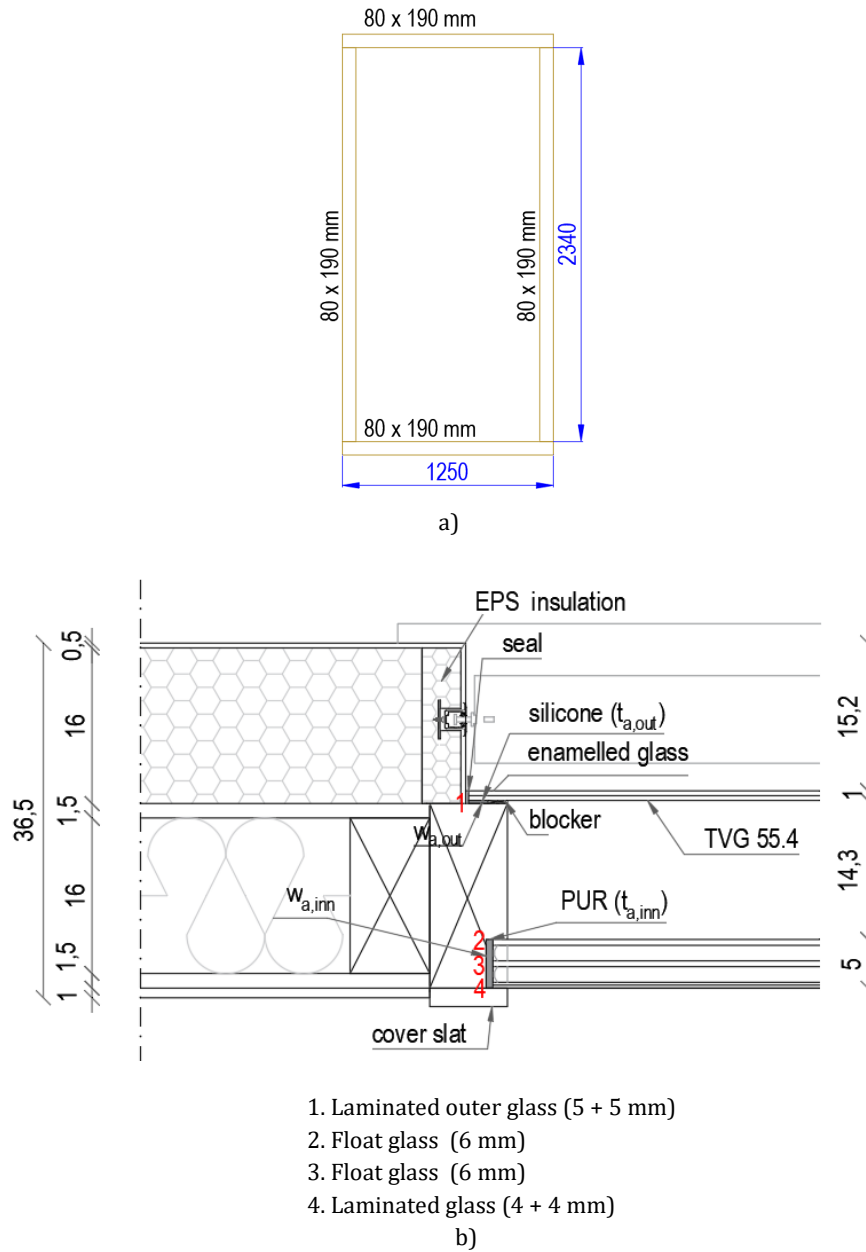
External dimensions of the wall samples and dimensions of the timber frame elements (a), and the system cross-section with installation details (b)
